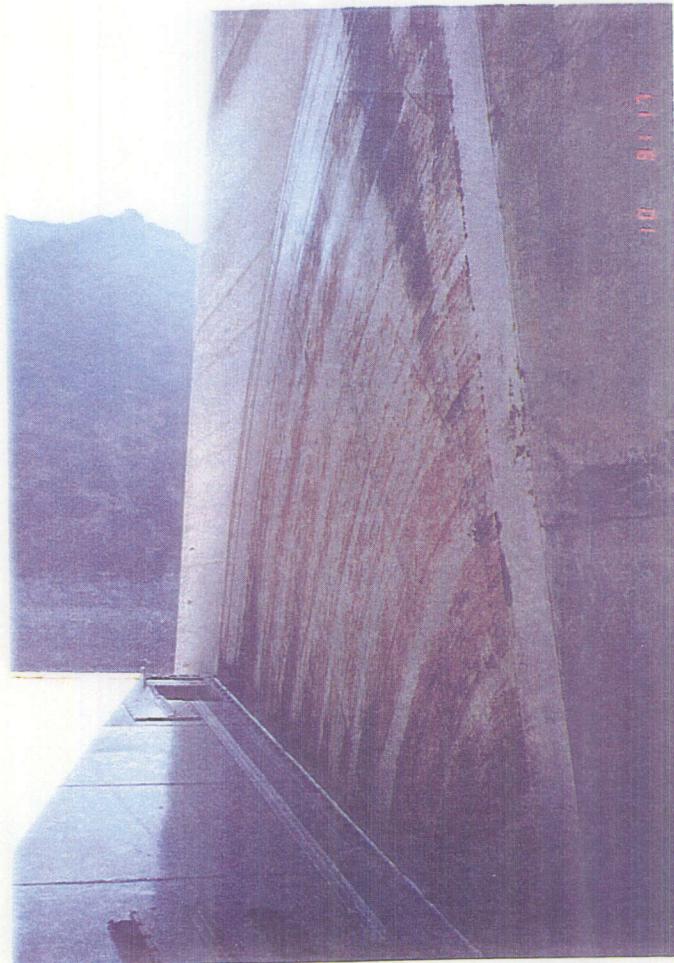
Morris Dam - 70' x 18' Drum Gates - Gate #1, downstream faceplate, left side. View of wallplate and damaged hollow bulb seal. - Sept 10, 1998.
